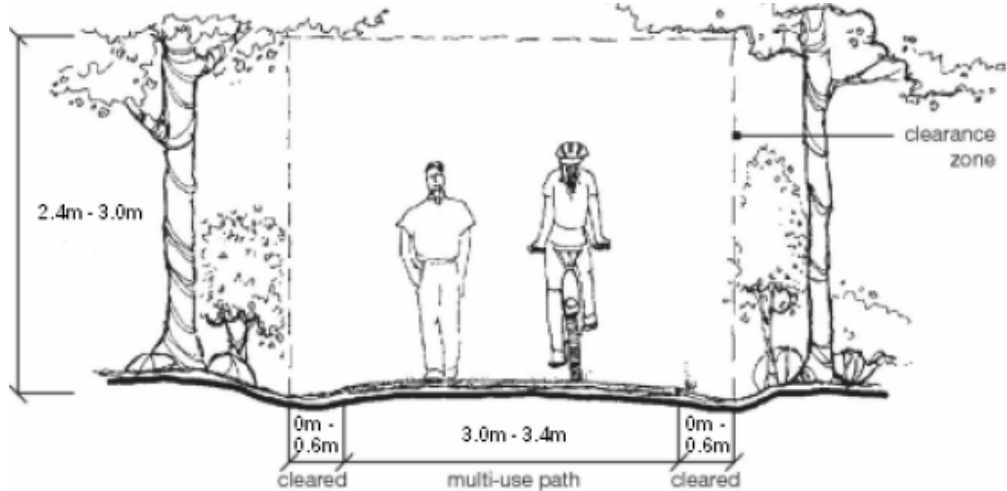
Cross-Section of a Typical Multi-Use Trail
